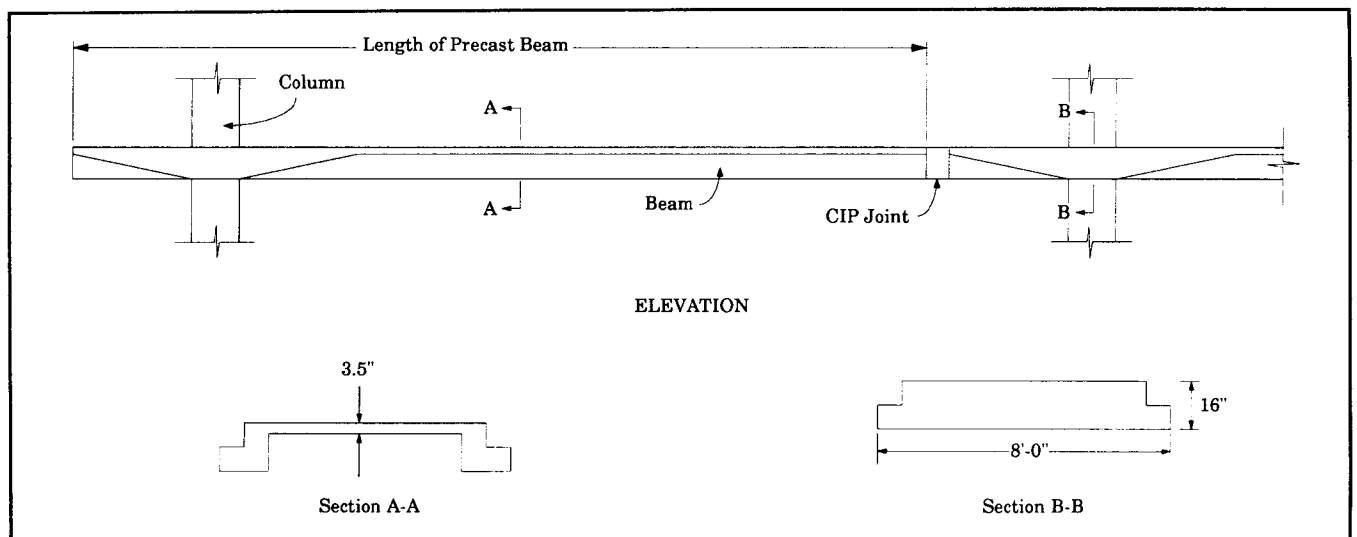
Beam elevation and cross sections at A-A and B-B.
